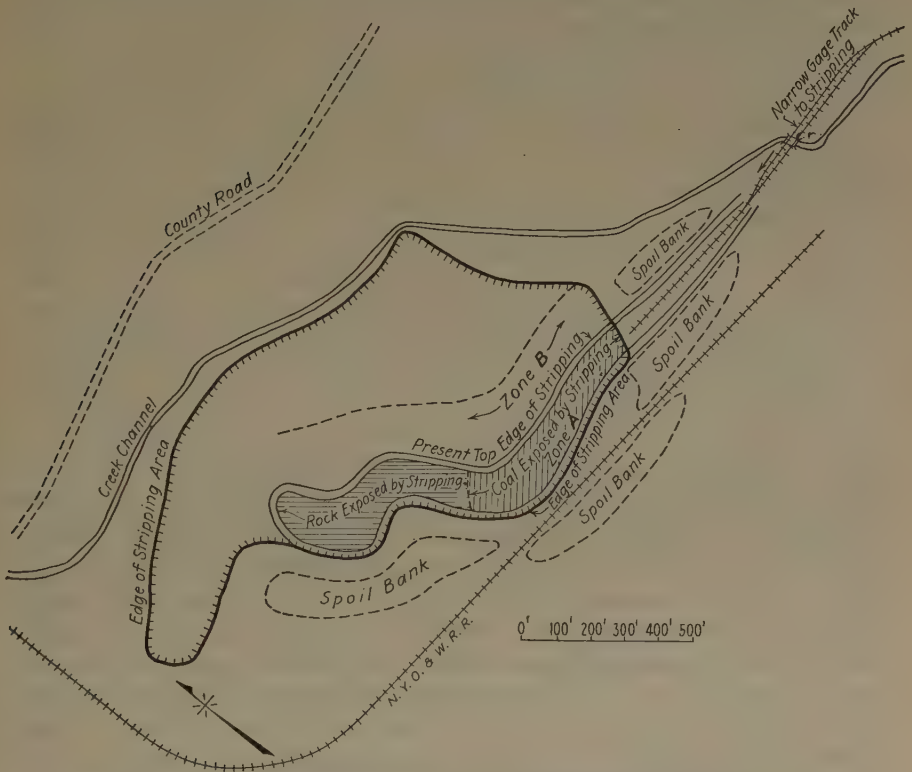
PLAN OF STRIPPING, CLINTON COLLIERY, GRASSY BED.
